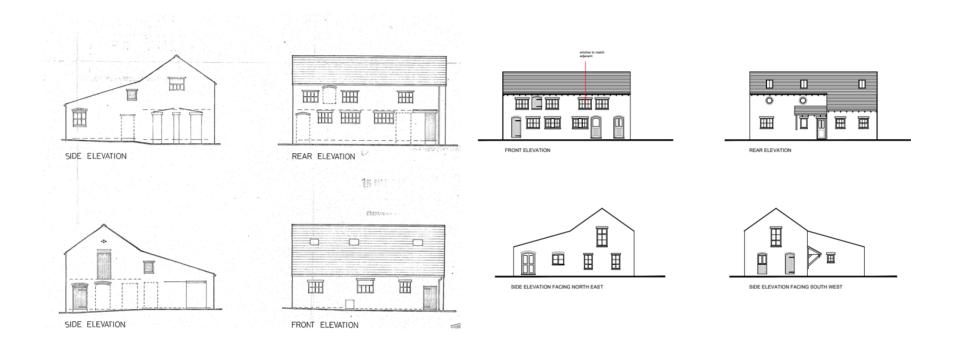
Left: Existing elevations 1993. Right: Proposed plans.
